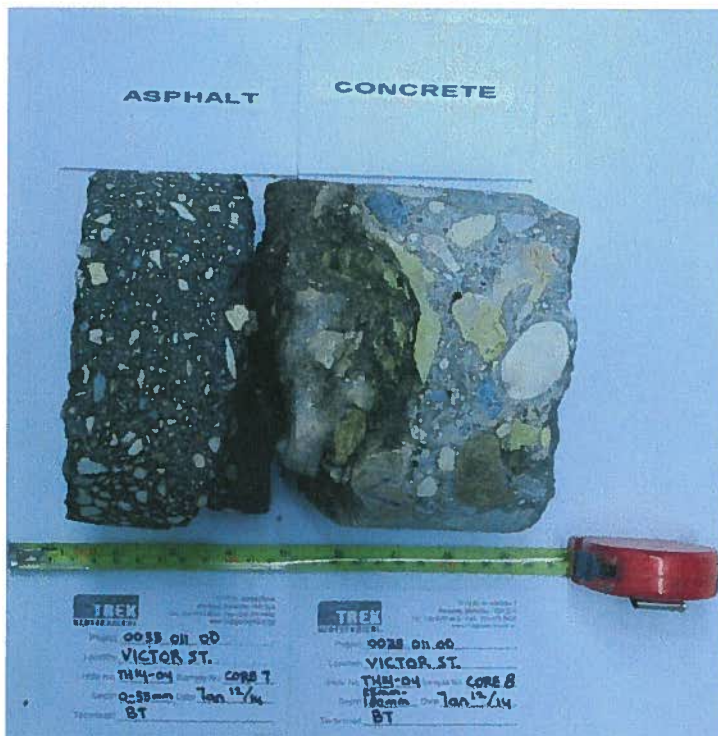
Asphalt and Concrete Core Sample from Test Hole TH14-04
